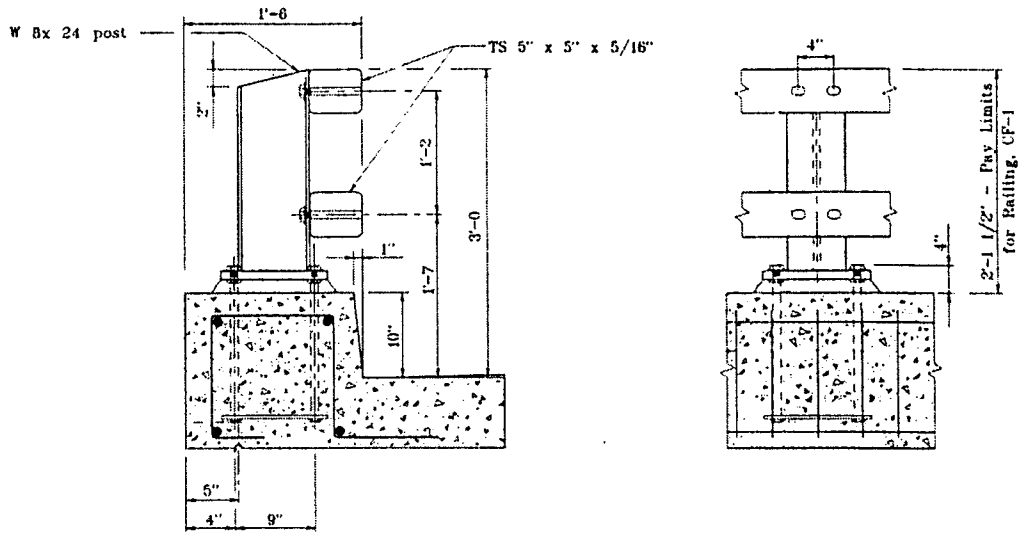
Type CF-1 Bridge Railing Curb and Post Detail
